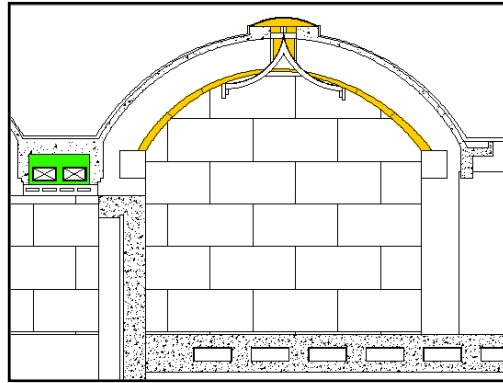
Section of Kimbell Art Museum showing skylight with prefabricated reflector; air ducts and MEP utilities in servant beam and hollow slab. (Drawn by Author)
